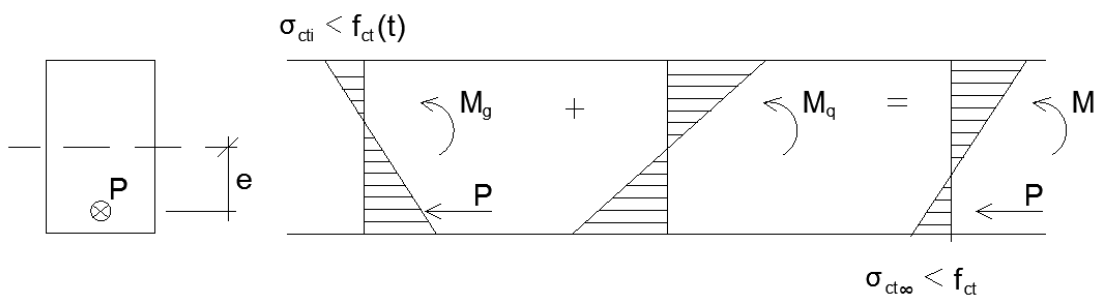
Example of stress distribution for a fully prestressed beam (Engström, *Design and analysis of prestressed concrete structures*, 2011).
